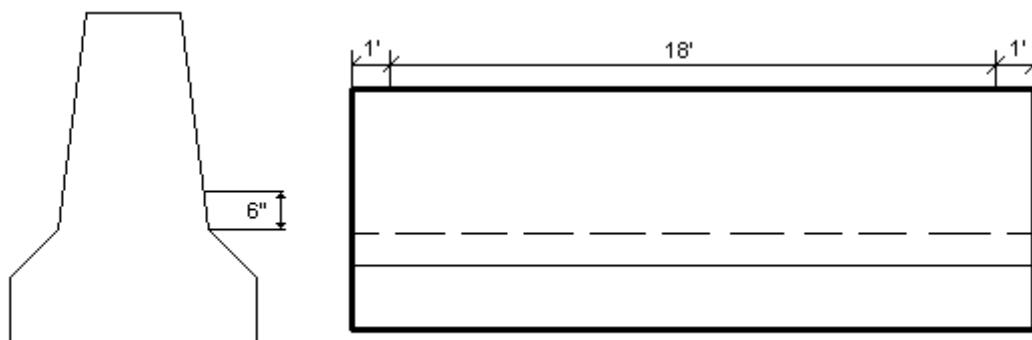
Cross section of Jersey Barrier Figure 2- Horizontal View of Barrier
